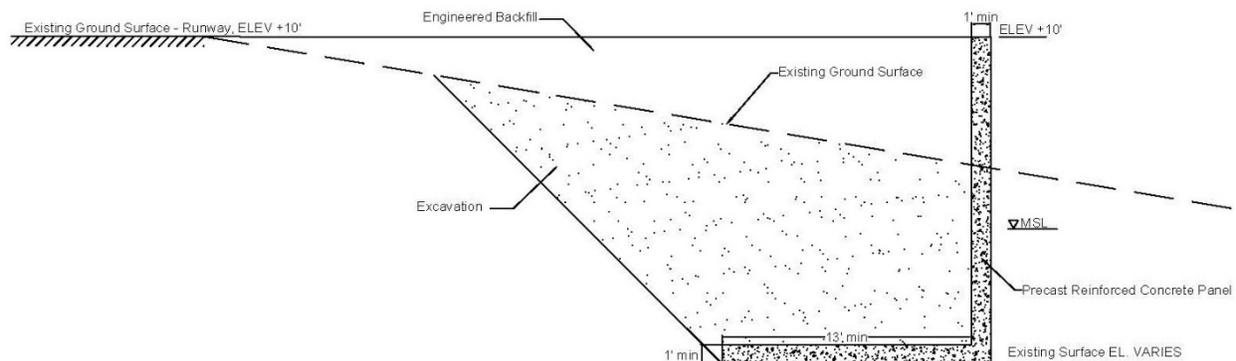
Alternative 5 - Preliminary Precast Concrete Panel Wall Cross Section
